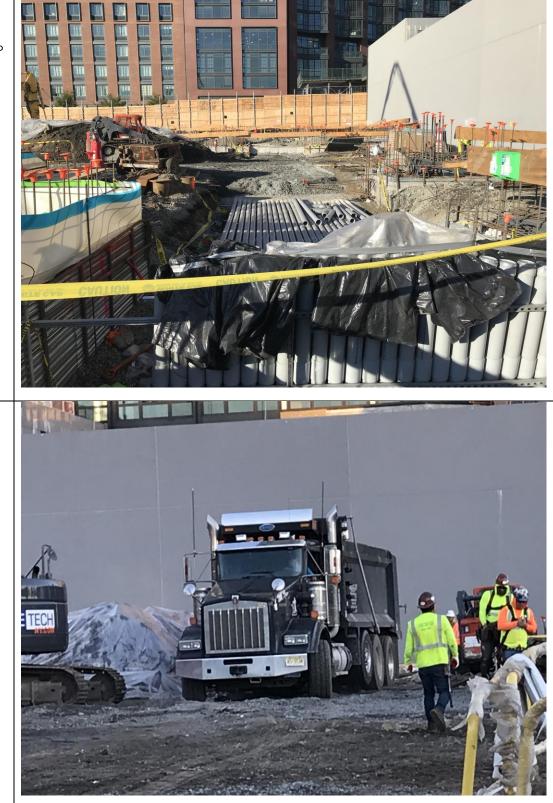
View of truck unloading imported 0.75-inch stone (facing north).
